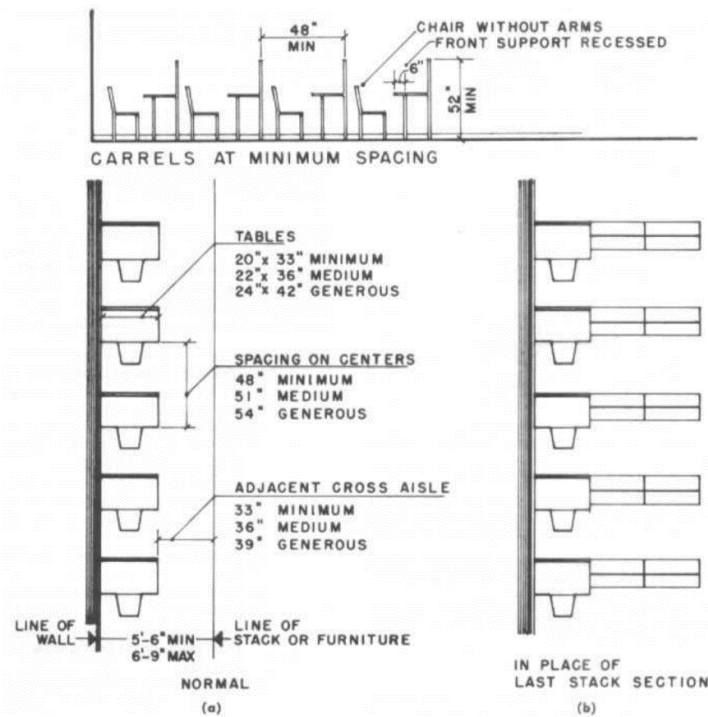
Carrels at right angles to a wall. (a) Suggests sizes and spacing and shows elevations. (b) Carrel in place of last stack section next to a wall. The working surface of the carrel should be in line with the stack range instead of the aisle in order to make it easier to get into the chair.
